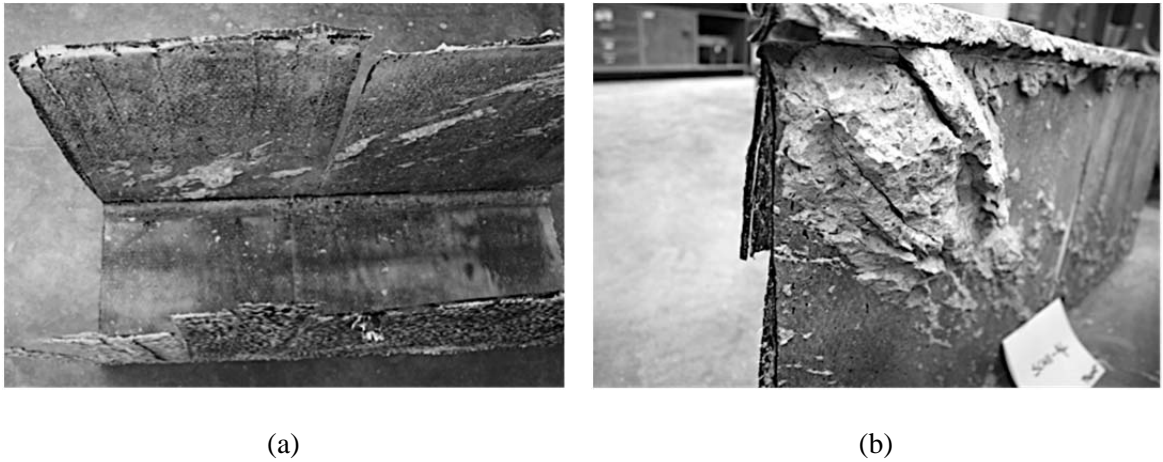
Separated CFRP U-wraps: (a) specimen LB1U, (b) specimen LB1UA.
